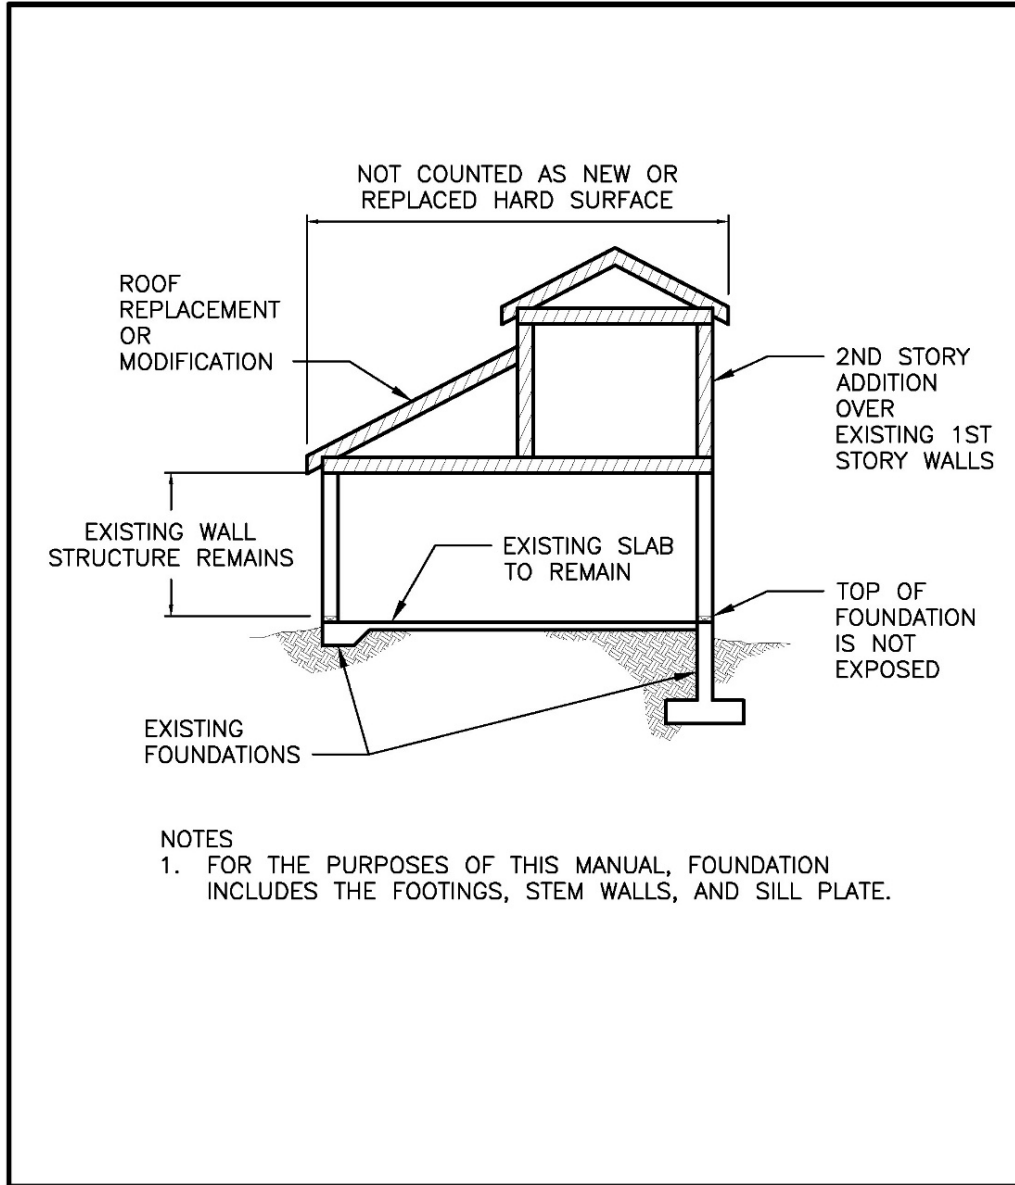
Example of Existing Hard Surface to Remain with Existing 1st Floor Walls Remaining.
